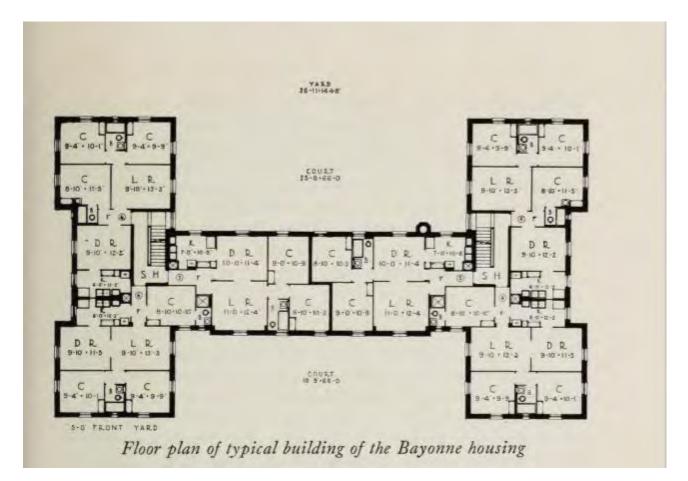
1925 drawing of a typical floorplan of one of the H-shaped buildings built for the Bayonne Garden Apartments (Thomas 1925:17).
